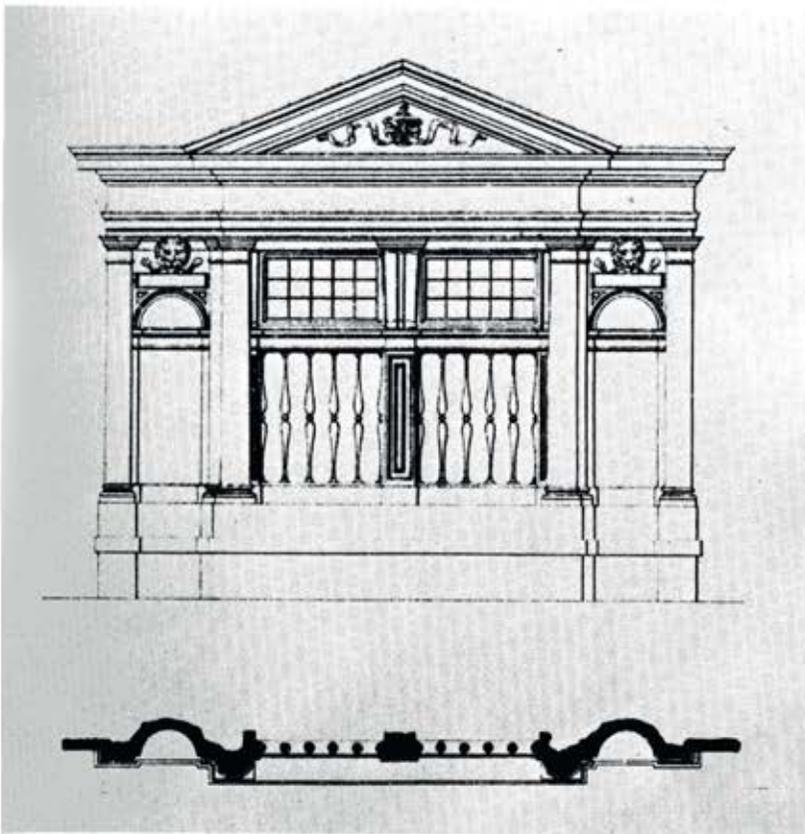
, Aedicula, Chapel of Leo X: elevation, ground-plan, cross-section (Gaudioso, pl. 28)
